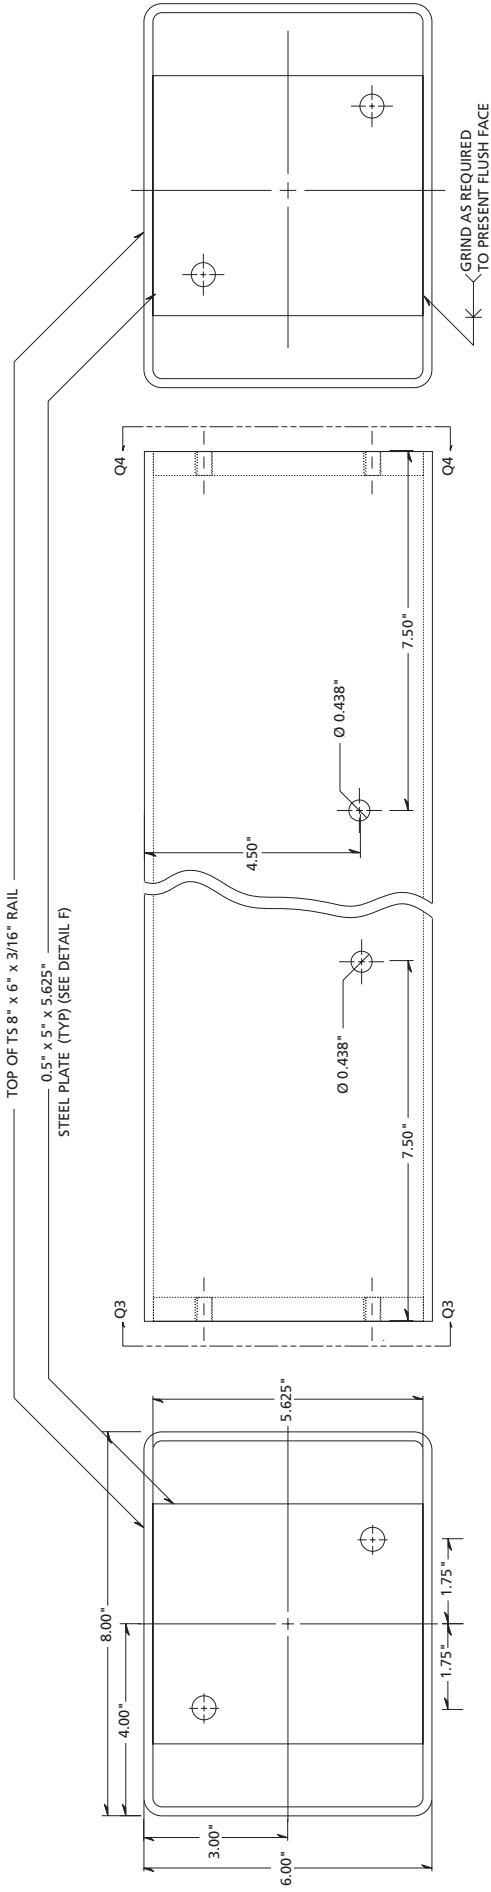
" x 6" STEEL RAIL PLUG PLAN VIEW A-A
